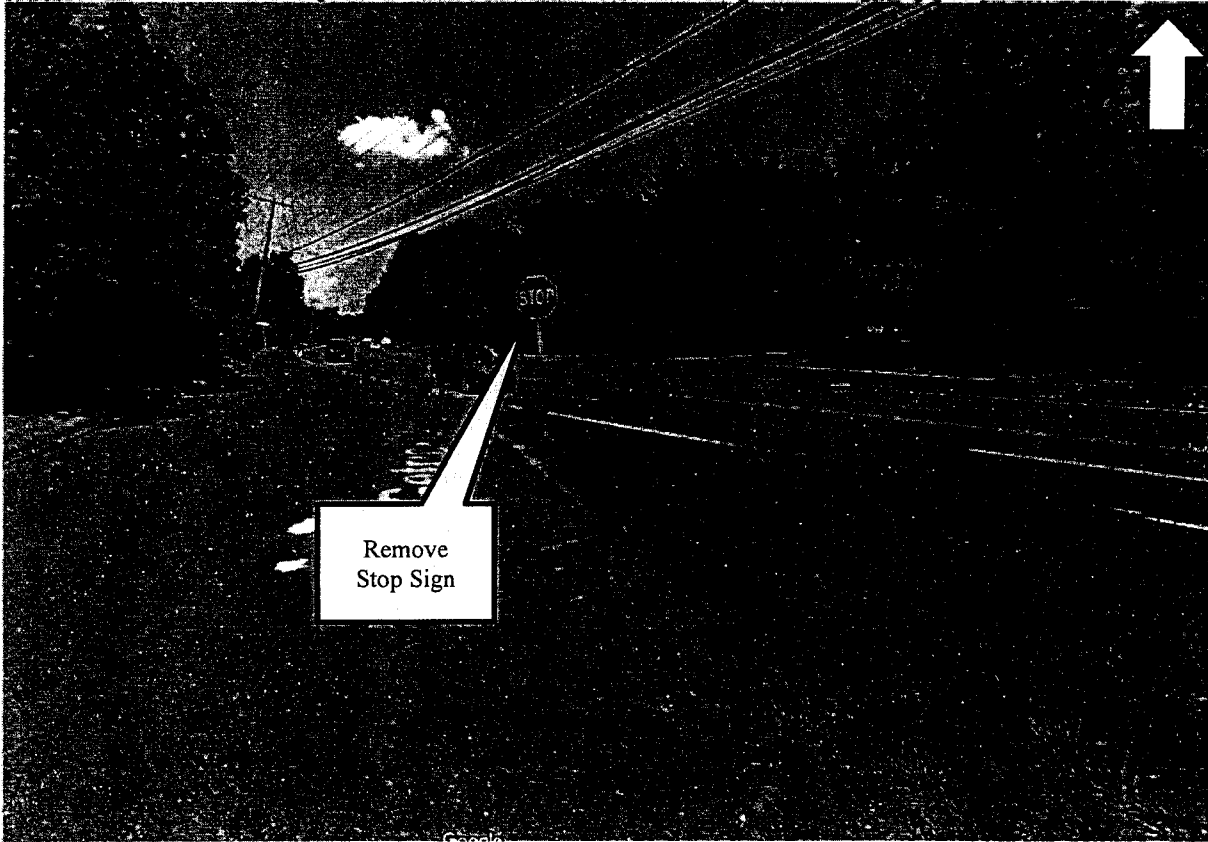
McGetrick Lane Layout Plan by Atlantic Traffic and Design Engineering, LLC
